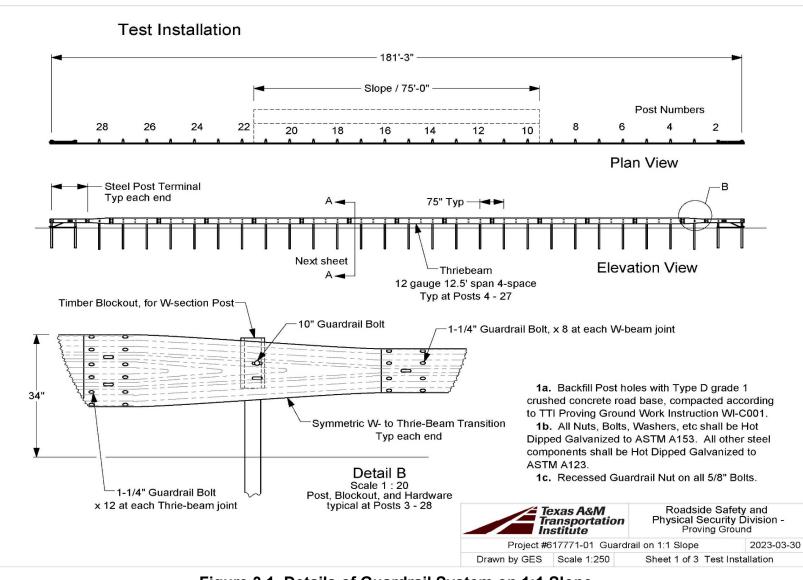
Details of Guardrail System on 1:1 Slope.
